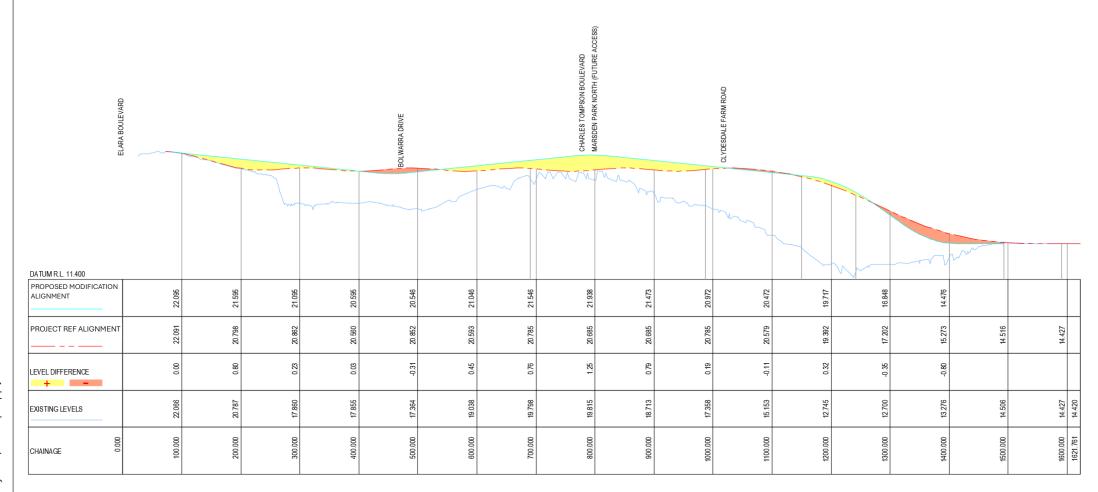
Longitudinal section – proposed modification comparison with Richmond Road Upgrade project REF alignment (from south to north)
